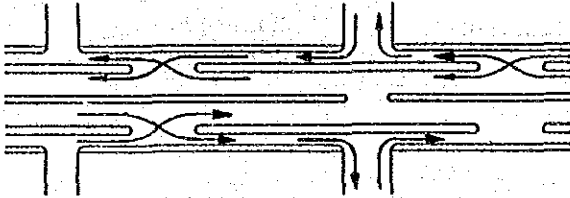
OPENING POINT LOCATION PLAN OF MEDIAN
